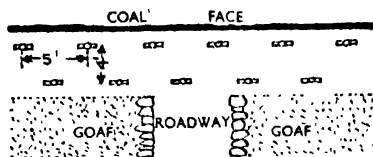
PLAN OF SYSTEMATIC TIMBERING
